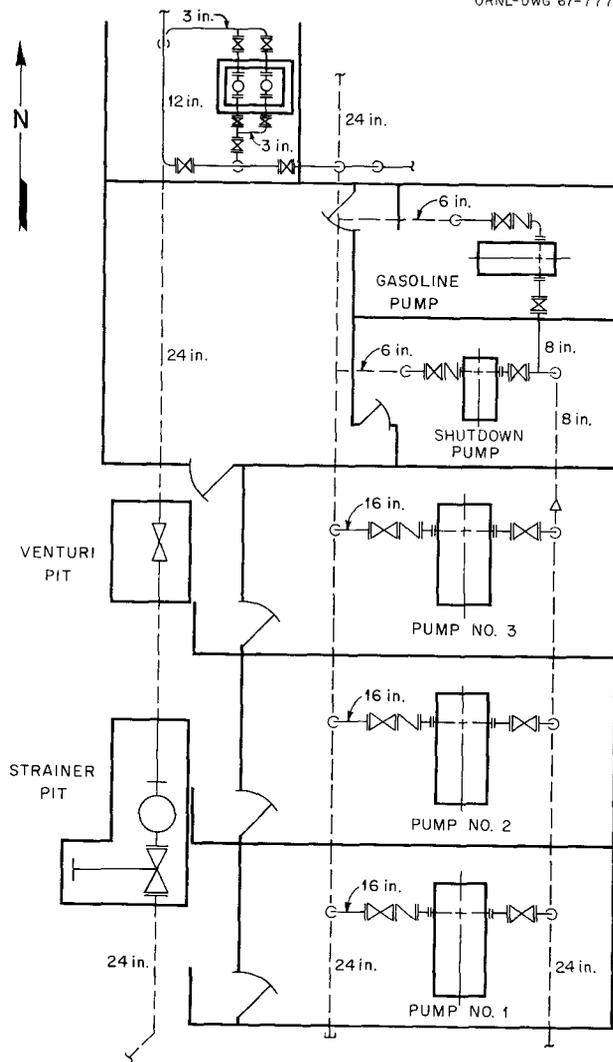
Schematic of Primary Pumphouse Floor Plan.
